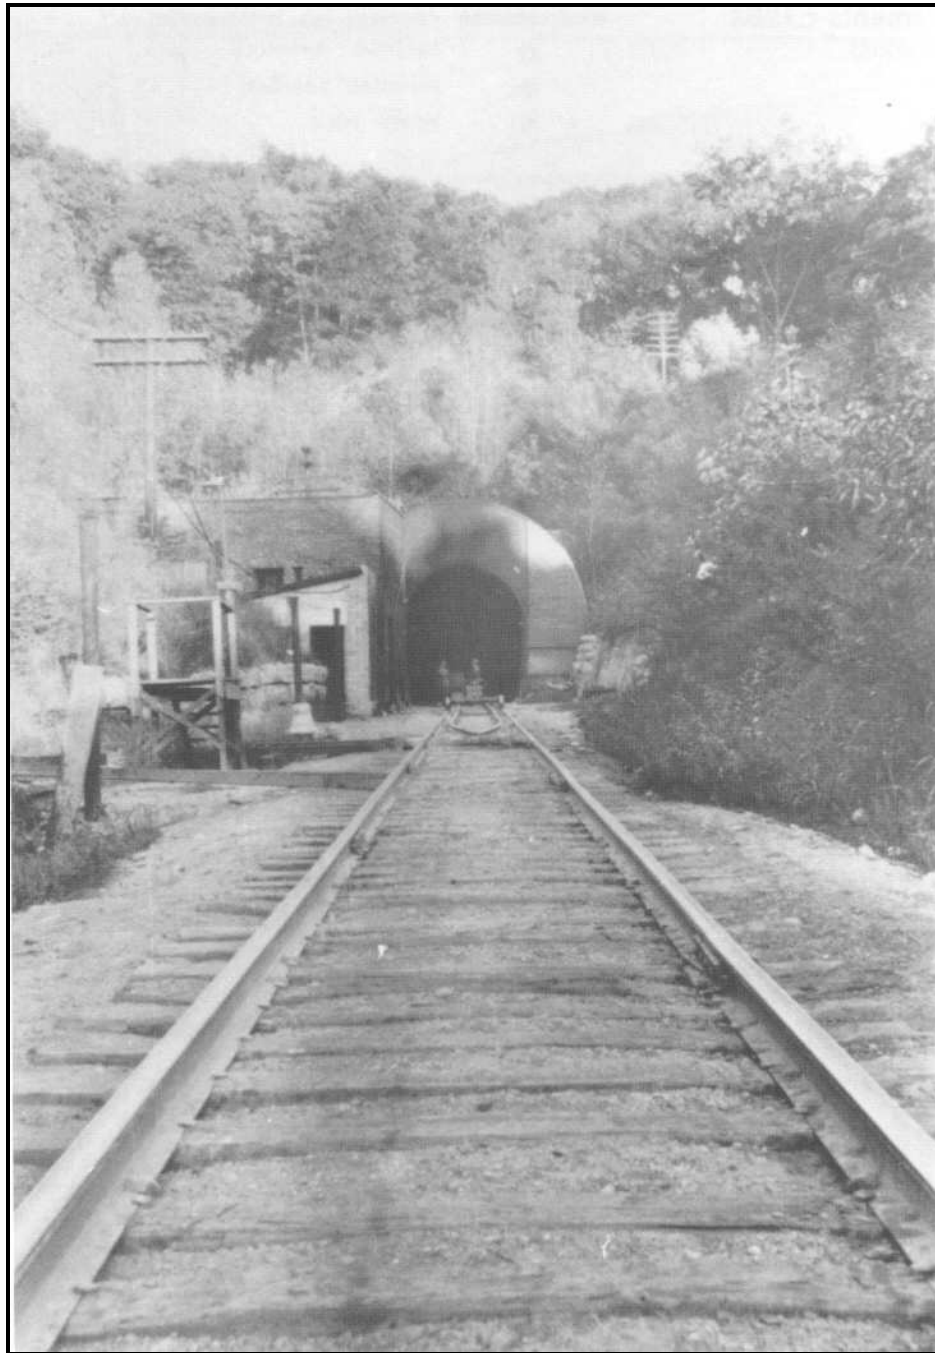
Undated photograph looking east toward the fan house and west portal to the Winston Tunnel. By this date, the fan house complex had assumed its present configuration (Huddleston 1998:47).
